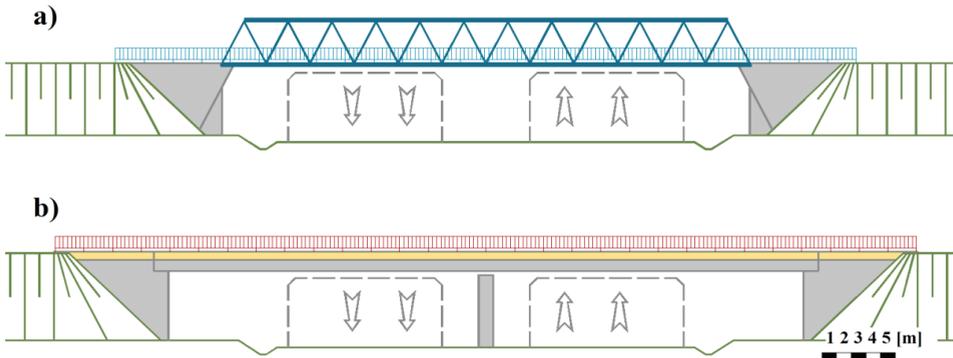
Viaduct: a) one span truss, b) two span continuous beam
